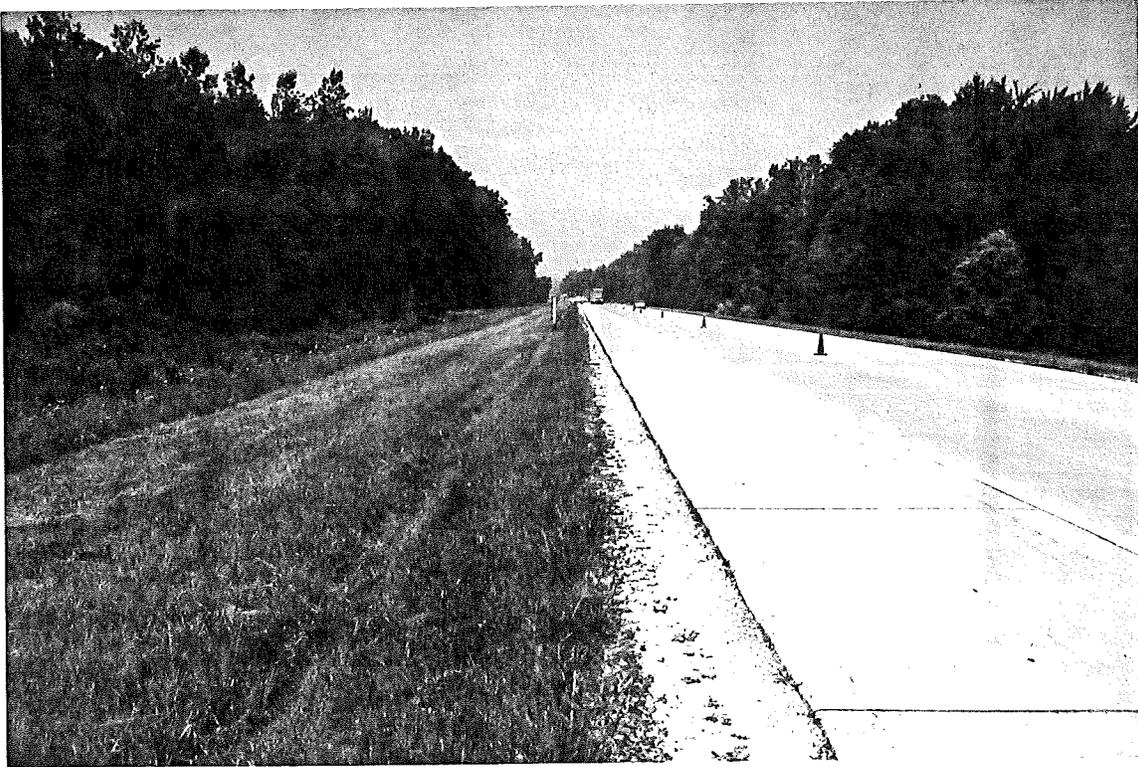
An overview looking west showing intermediate shoulder joints on CSN# 77023-21586A EB. The slabs in the driving lanes are 41 ft long.
